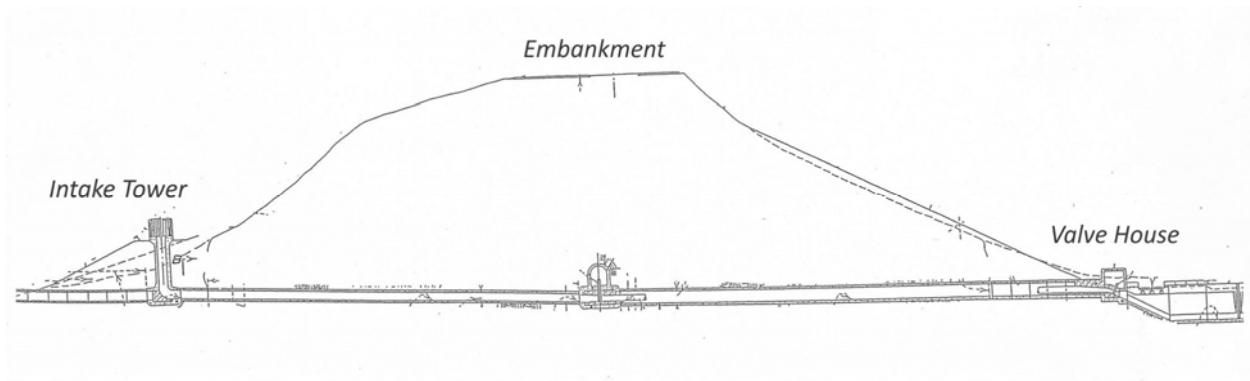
CROSS SECTION DRAWING OF MASON DAM (FROM RECLAMATION).
